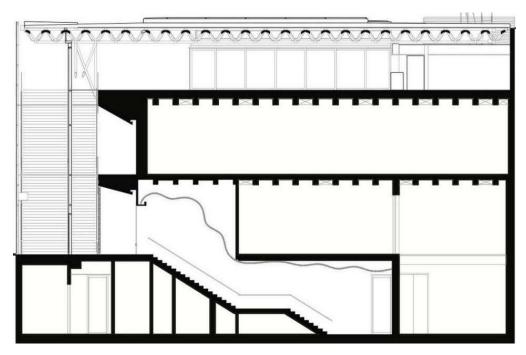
Section view of the building showing the space frame roof structure¹⁵⁰
